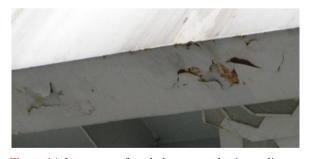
Large area of steel plate rust and paint peeling 图 14. 钢板大面积锈蚀、油漆剥落
